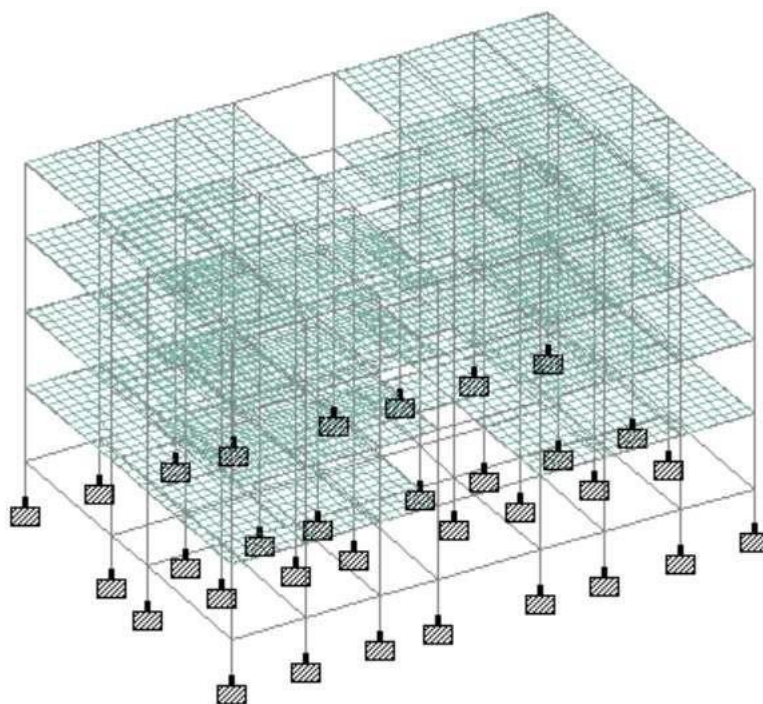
Hostel Building with modified G+3 floors (Model 4)
